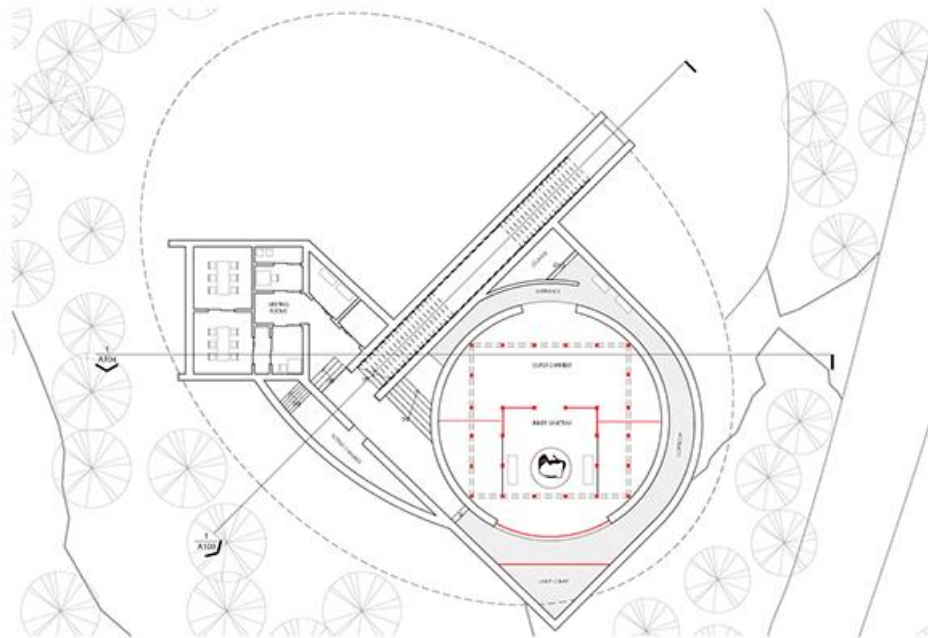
Underground plan of Water Temple (Source: Bêhance)
